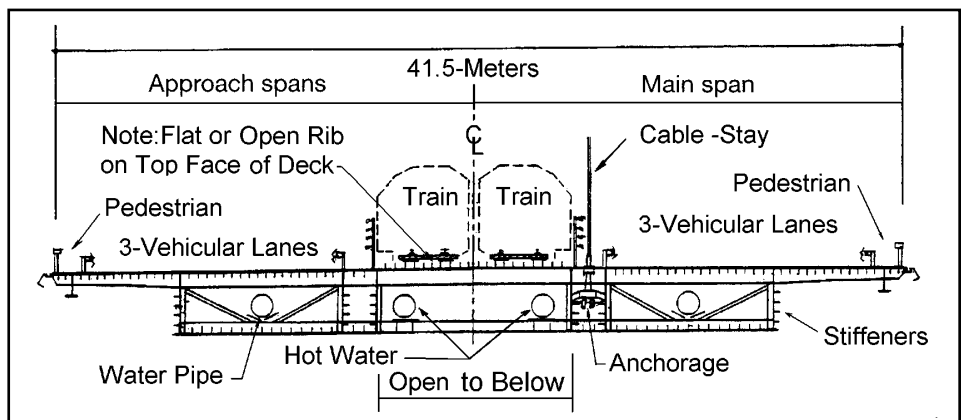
South Bridge (cable stayed) of Ukraine (split-section).
